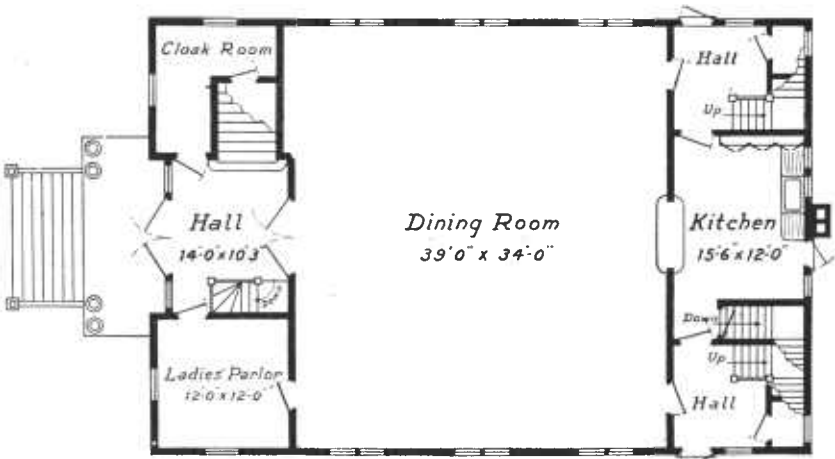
First floor plan of Newbury building. (By courtesy of I. S. Hann, architect.)
